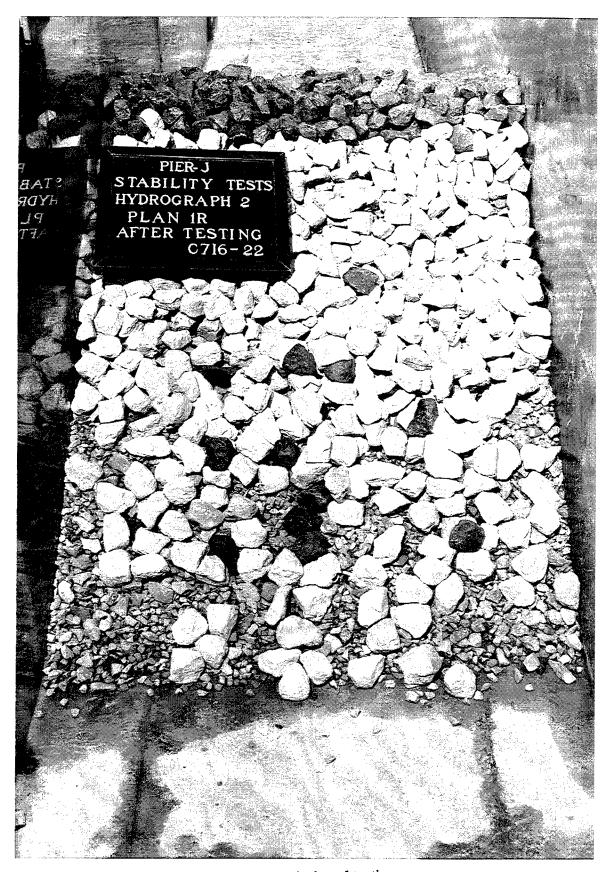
Harbor-view of Plan 1R at the conclusion of testing
